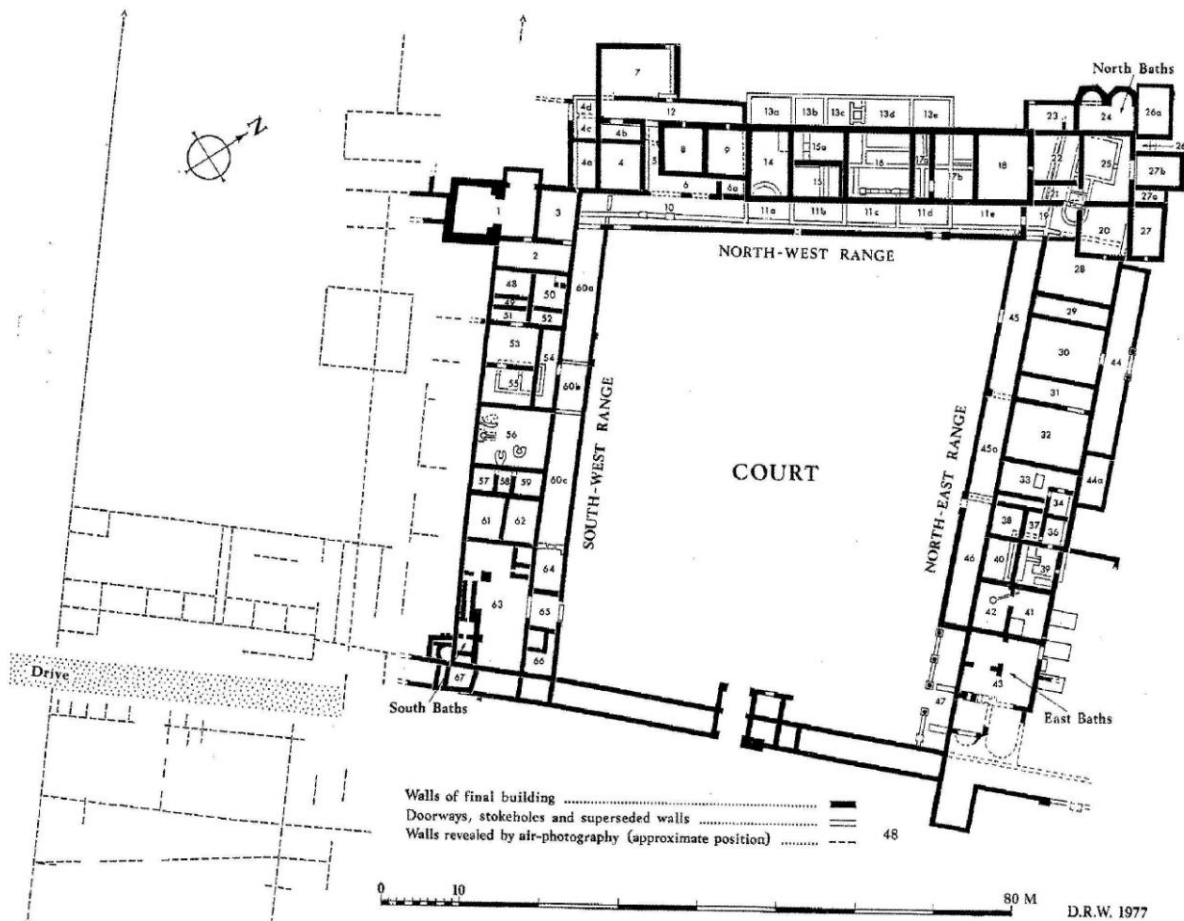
General plan of the North Leigh villa, as revealed up to 1980. Mosaic pavements in Rooms 1, 4b, 5, 6, 8-10, 15, 16, 21, 24, 25, 26a, 30, 35 & 48. Plain tessellated floors in Rooms 2, 17a, 19, 29, 31, 33, 44-46, 54 & 60. Under-floor heating in Rooms 1, 8, 9, 18, 20, 24, 26a, 27, 36, 43 & South Baths. (Drawing: D.R. Wilson and English Heritage)
